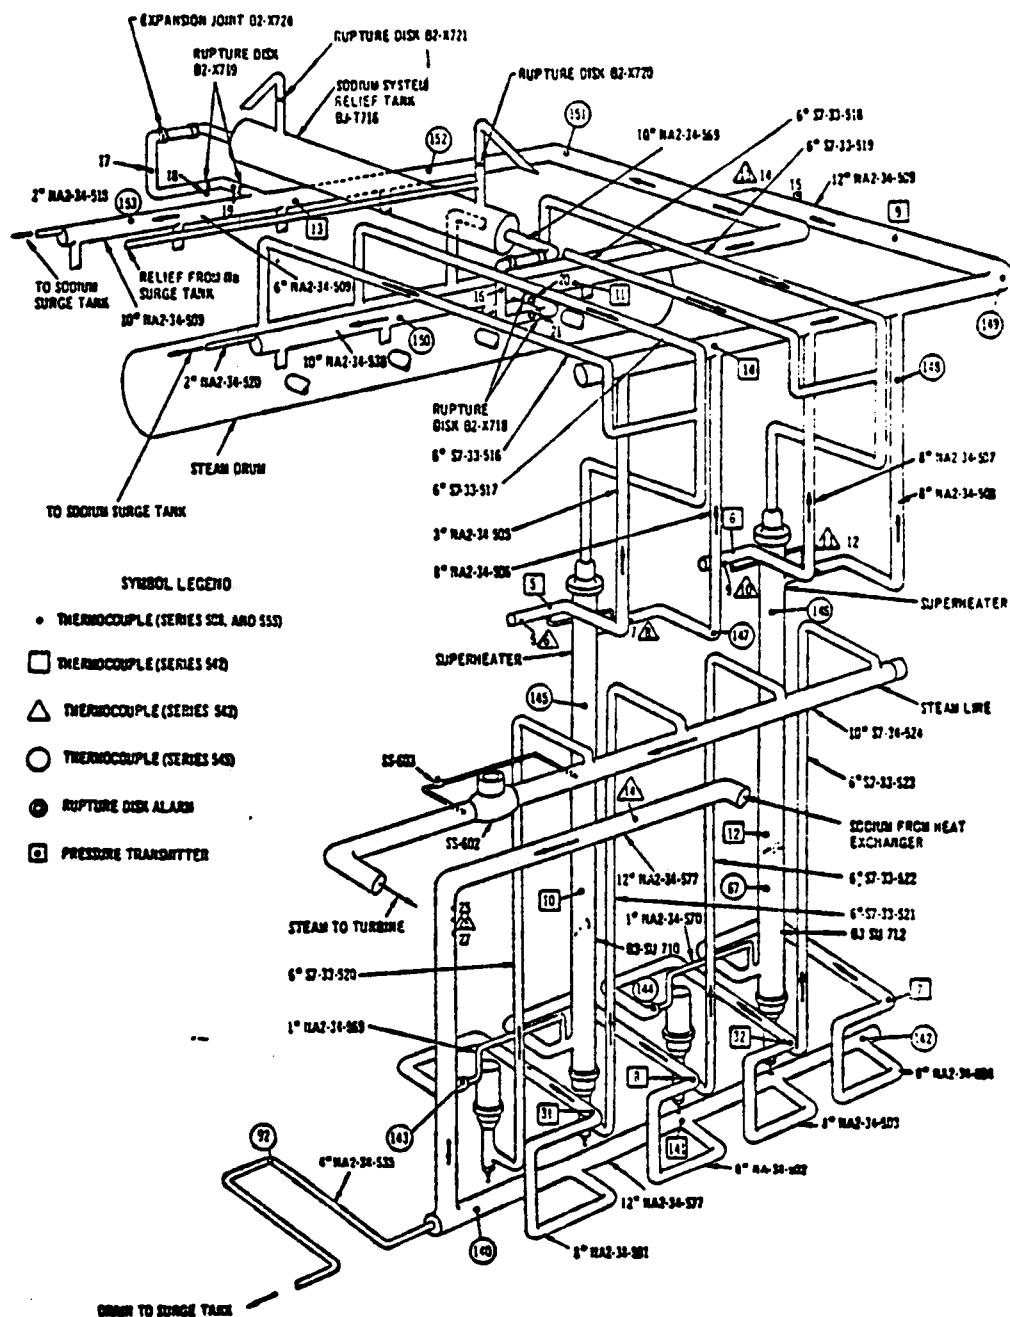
EBR-II Superheater Details and Sensor Locations.
